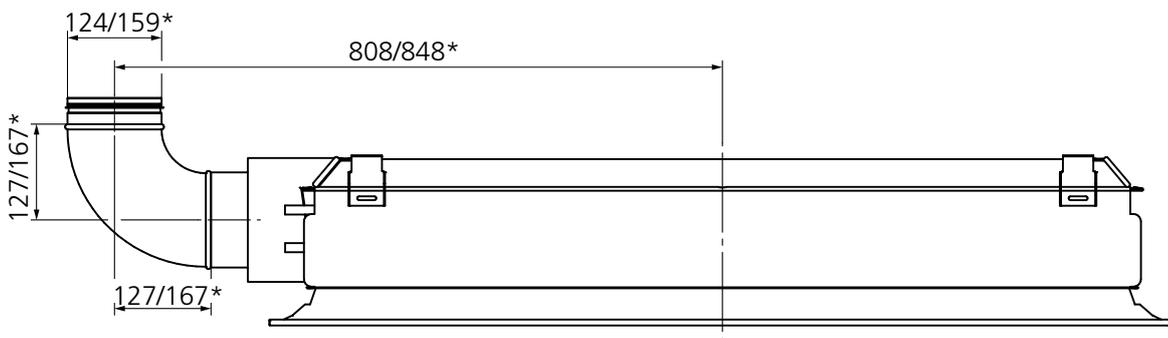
Dimensional drawing, short side connection with bend Ø125/160
